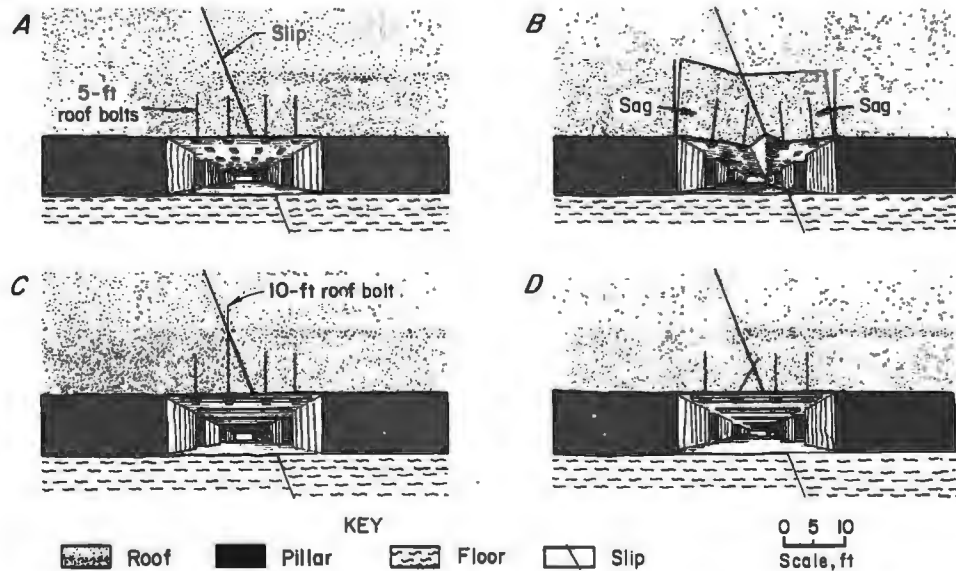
Slip plane bolting diagram. A, Regular bolting plan; B, roof behaving as independent cantilever beams; C, beam built by using longer roof bolt and mat; D, beam built by using angled roof bolt and mat.
